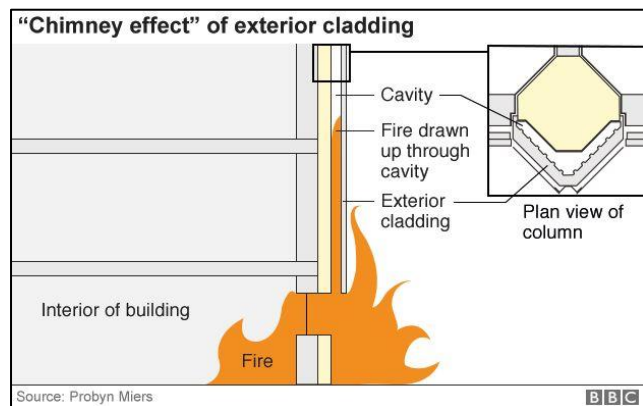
Exterior cladding of Grenfell Tower (Source: BBC)
